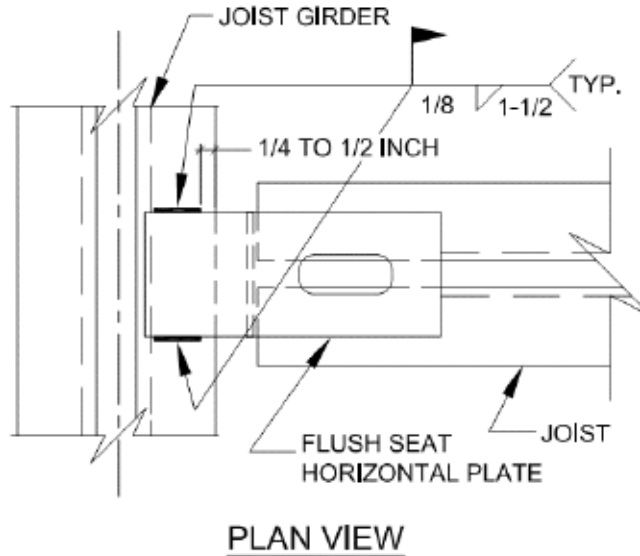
Flush Seat to Joist Girder Weld
